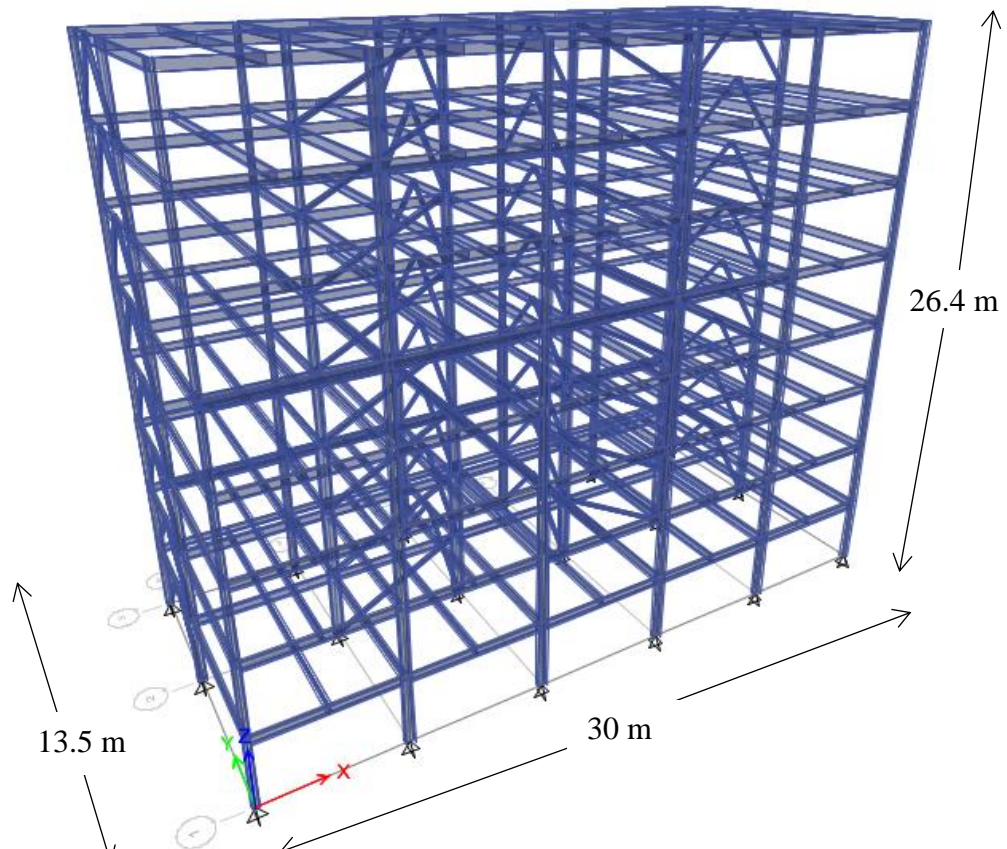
General 3-D view of the dormitory building (RB-I).
